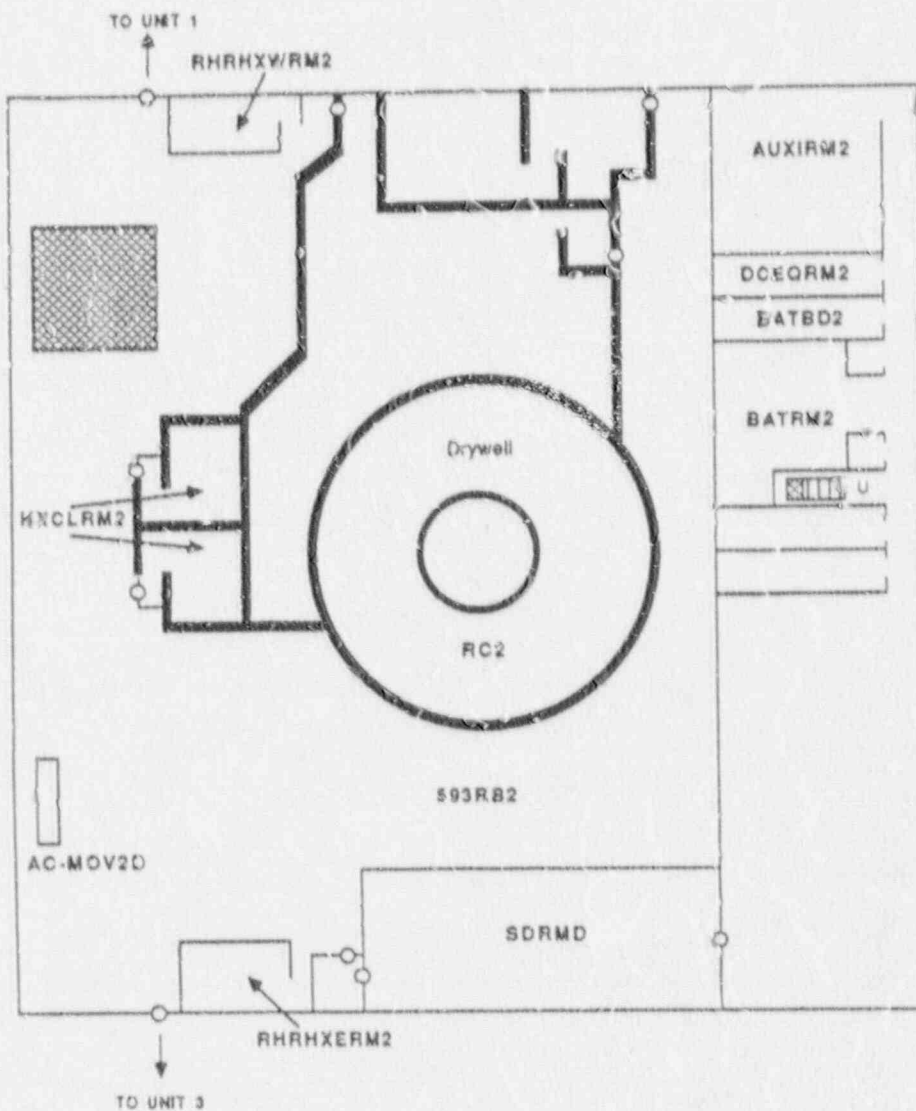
Browns Ferry Unit 2 Reactor Building - 593 ft. Elevation.
